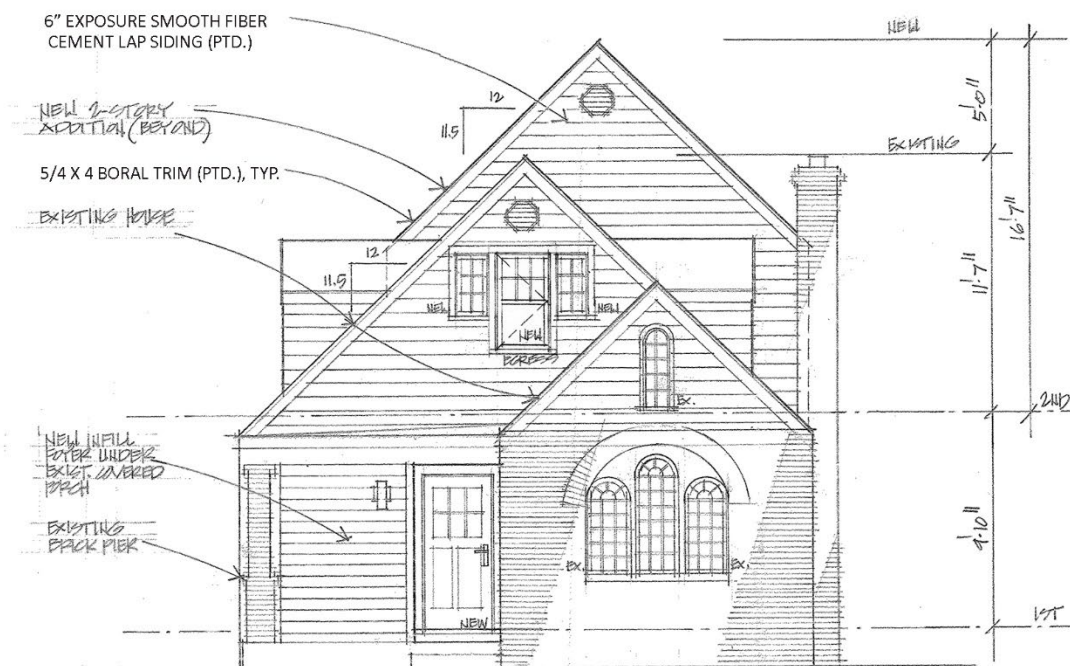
The proposed front elevation shows how the rear addition will appear from the right of way.
